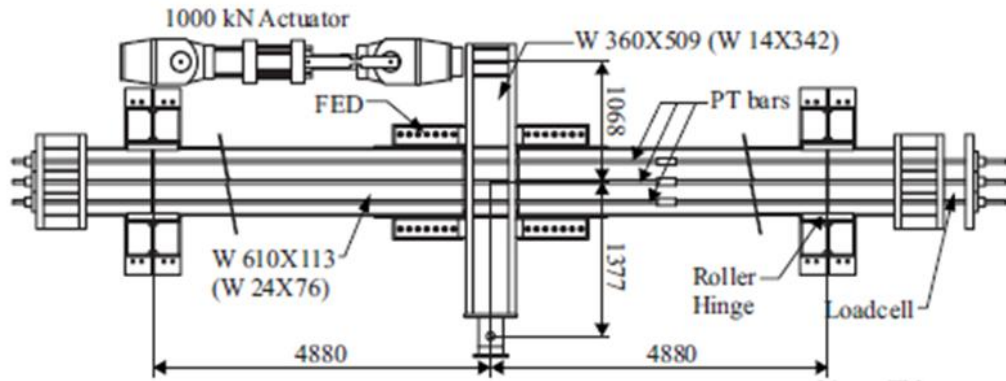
Test specimen for interior beam-column assembly (Kim and Christopoulos 2008)
